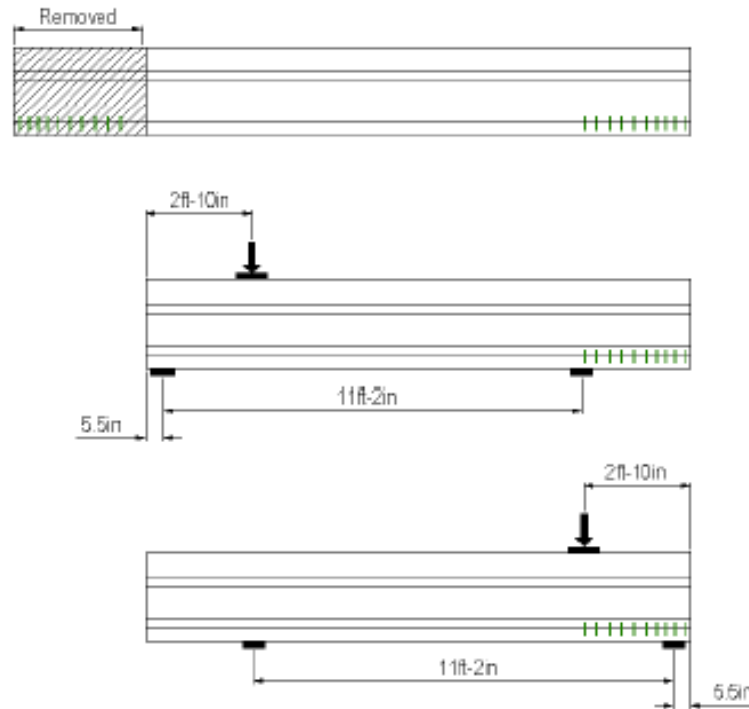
Specimen Fabrication and Test Setup (Ross 2010)
